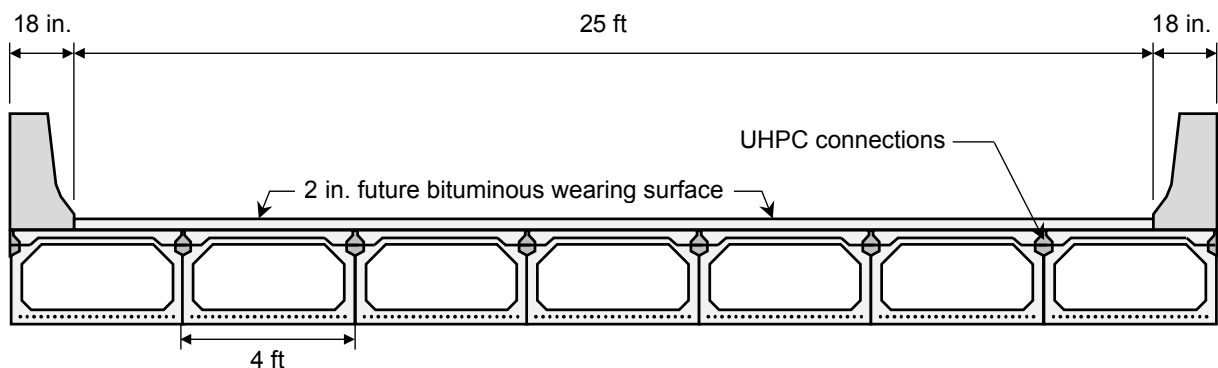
Typical bridge cross section for the configuration used to develop design tables and design aids. Note: UHPC = ultra-high-performance concrete. 1 in. = 25.4 mm; 1 ft = 0.305 m.
